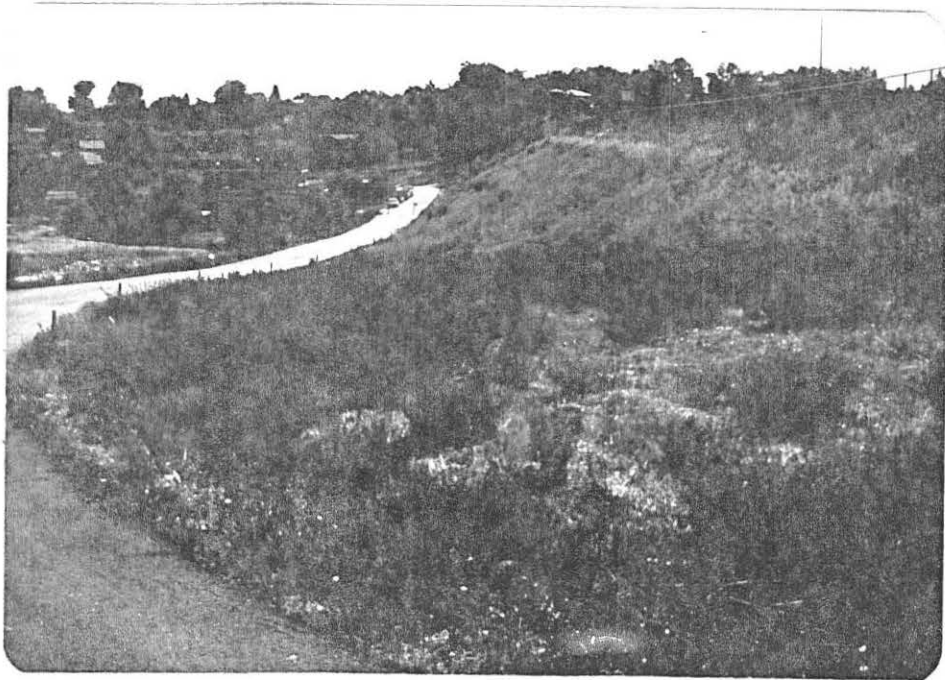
Downstream slope of embankment, with service road to filter plant at left.
